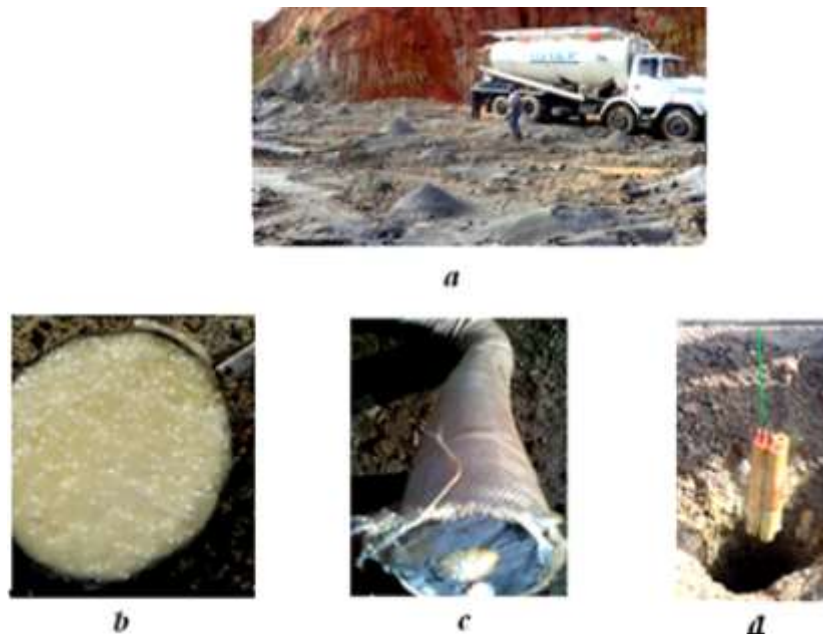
Charge of boreholes on the block: a – appearance of the unit with a charging machine; b – emulsion explosive such as Anemix; c – charge section with conversion explosive; d – installation of the initiator mounted from the TNT checker TN - 400 in the borehole
